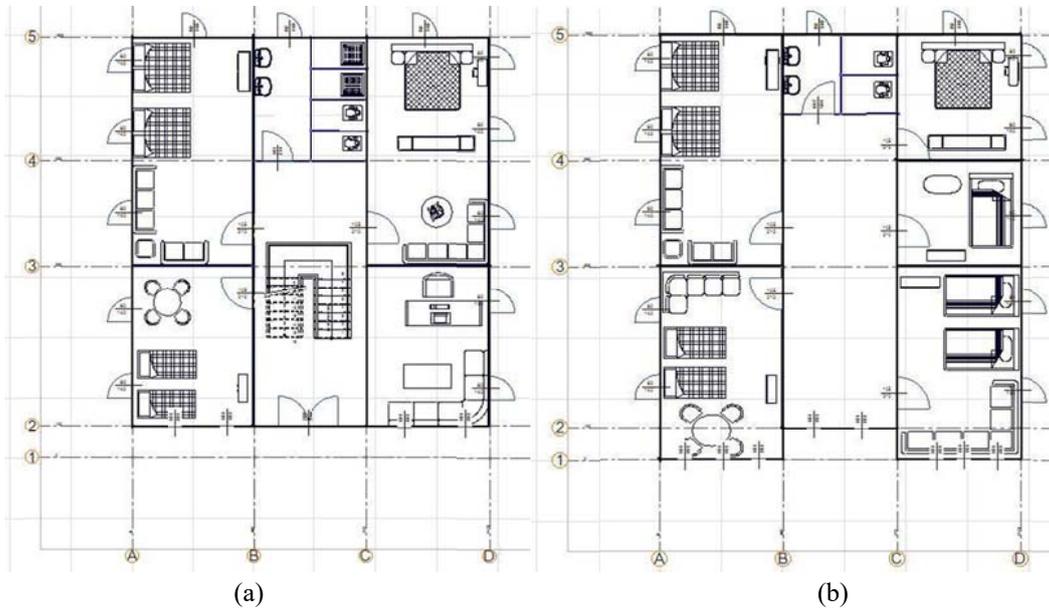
Floor plans of the Hotel: (a) Ground floor (b) First floor
